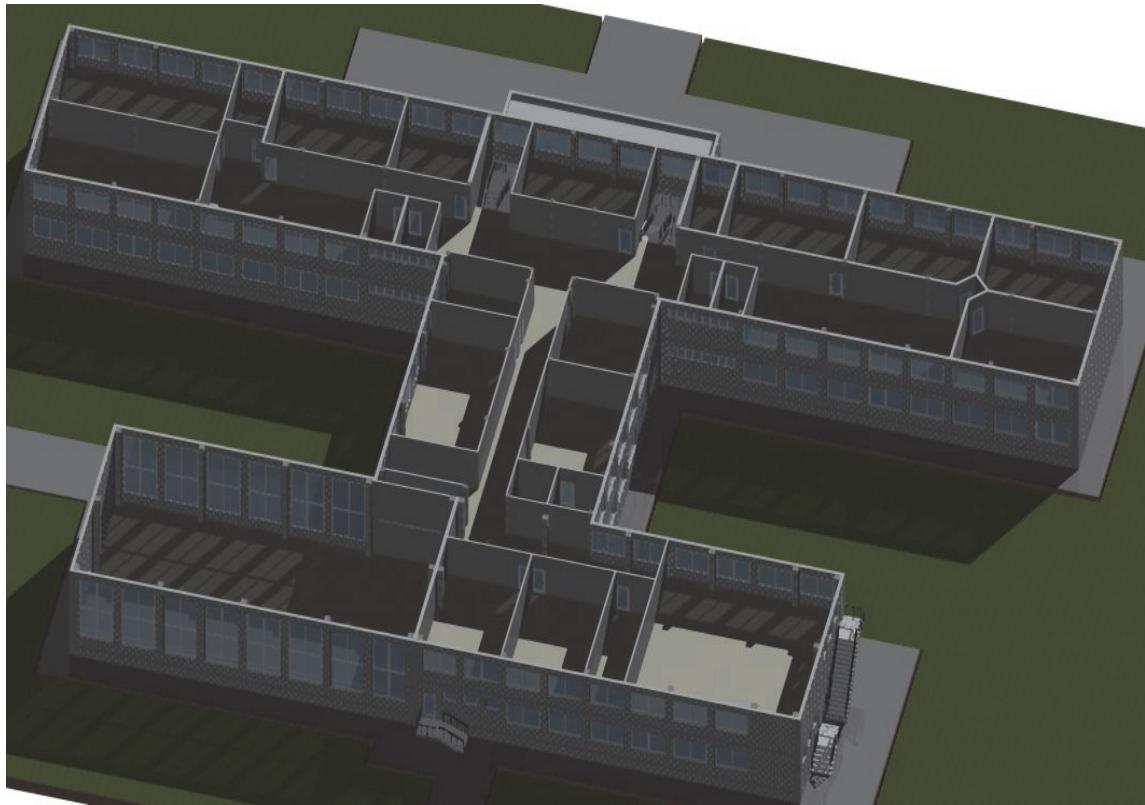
Typical wall layout for Typology D-2 school buildings (EEC et al., 2015).
